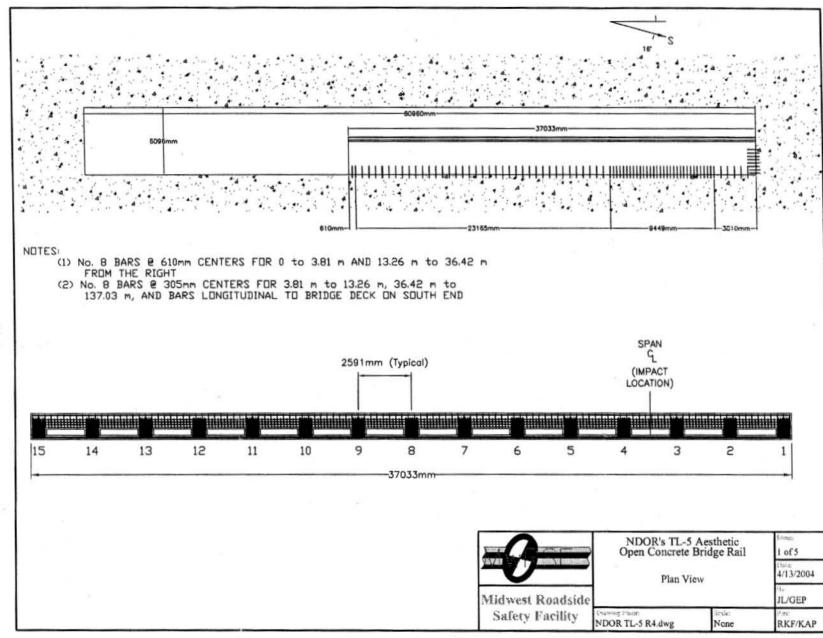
Layout for NDOR's TL-5 Aesthetic Open Concrete Bridge Rail
